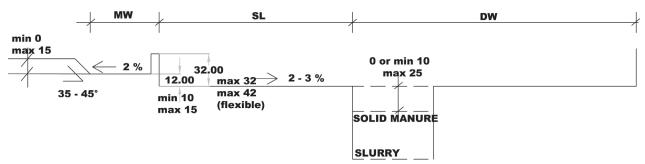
longitudinal section of a "short standing" tying stall (All dimensions are expressed in cm.).
